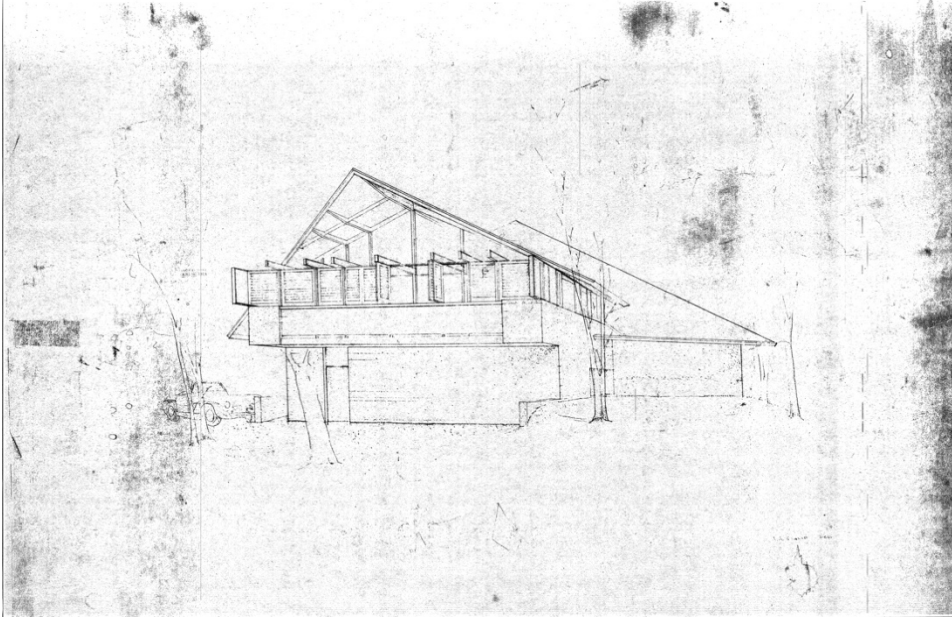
Elevation drawing, south façade. ca 1958 Van Gelder Studio Archive.
